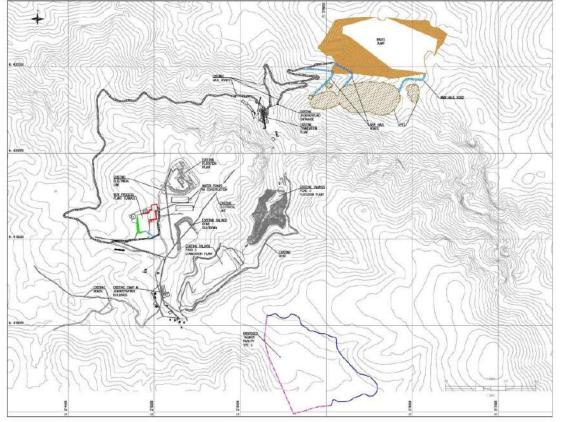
Zgounder Mine Existing and Future Infrastructure
